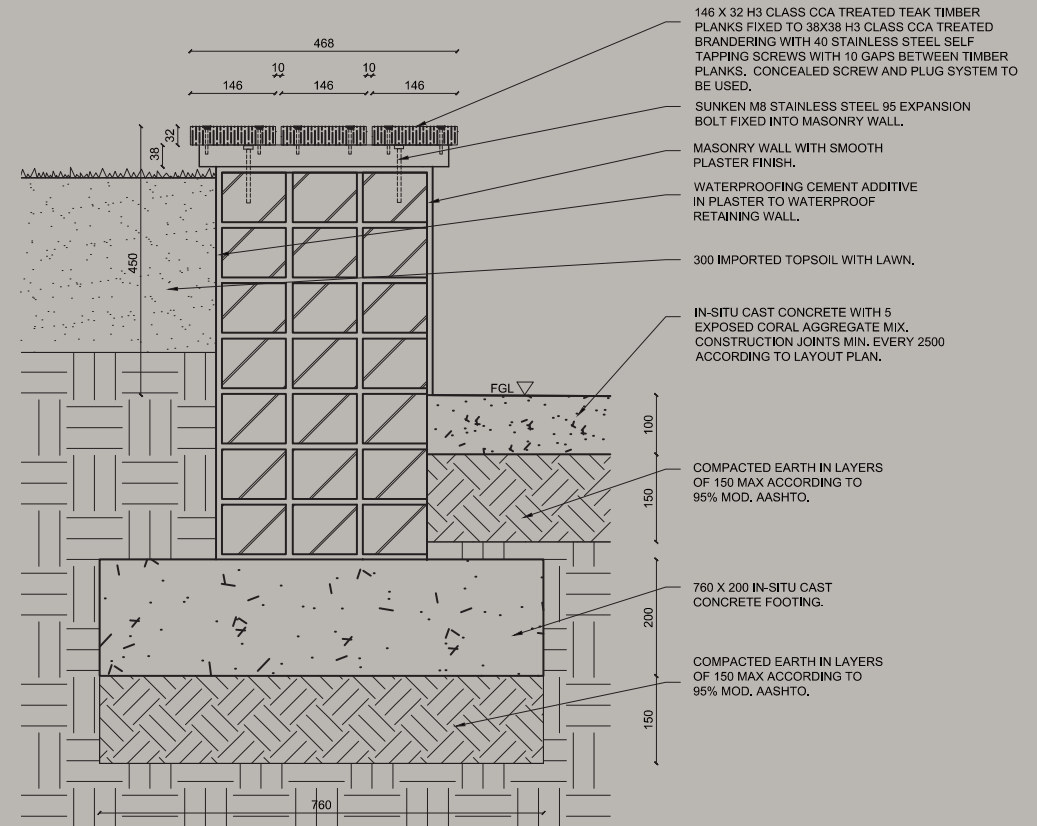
Detail Section (1:10) of Bench (Author, 2014).
